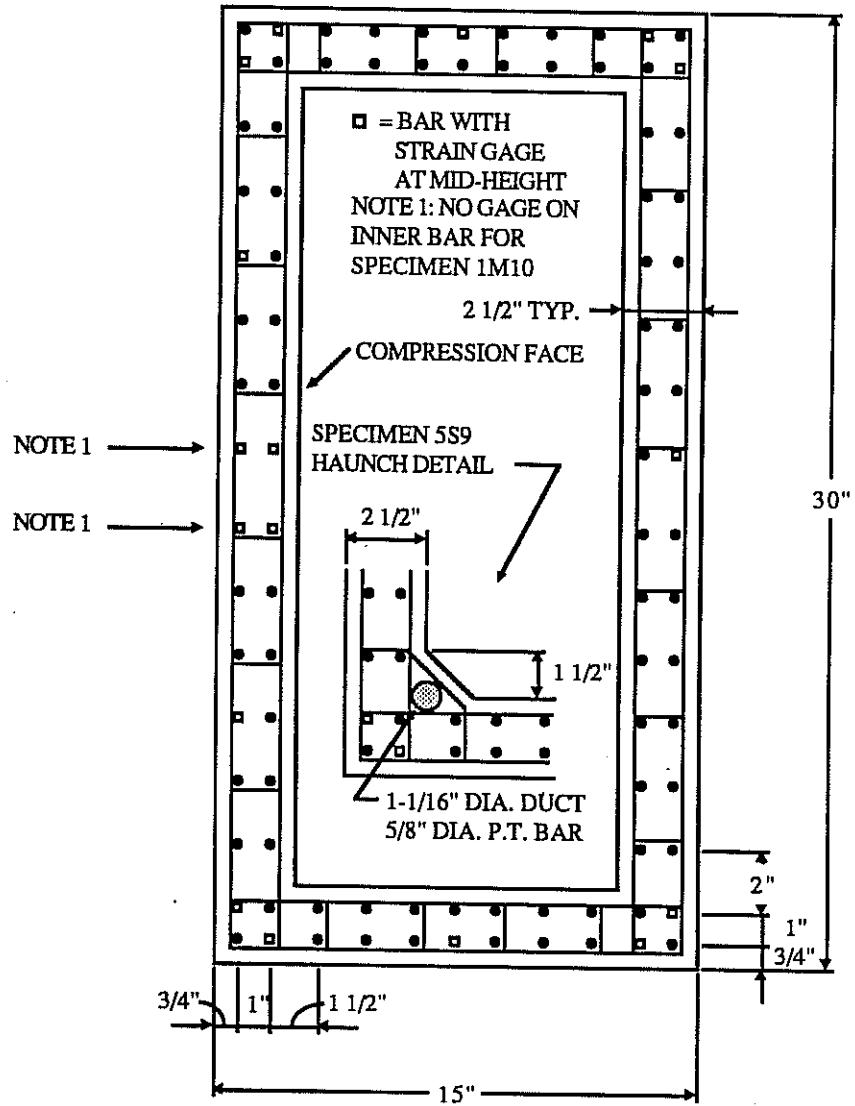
Cross Section for Specimens 1M10 and 5S9
